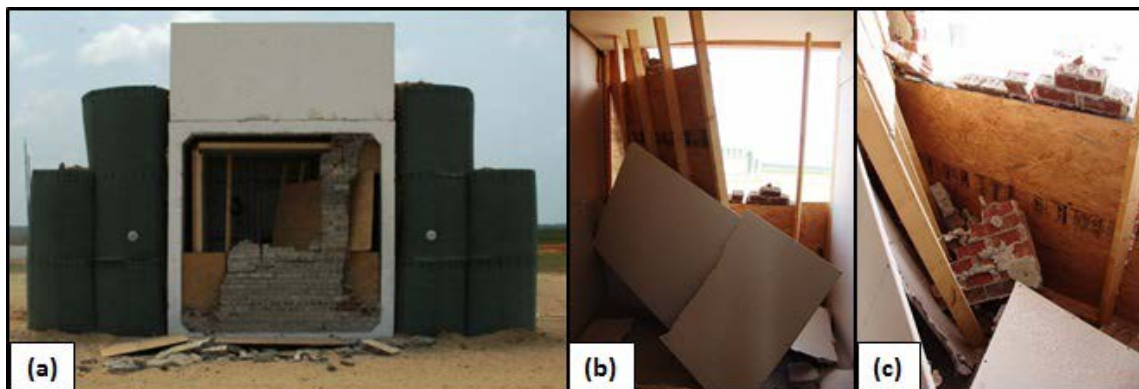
Wall response. (a) Heavy damage to top half of wall. (b) Sheetrock deflected into the structure. (c) Bricks from façade found inside structure.
